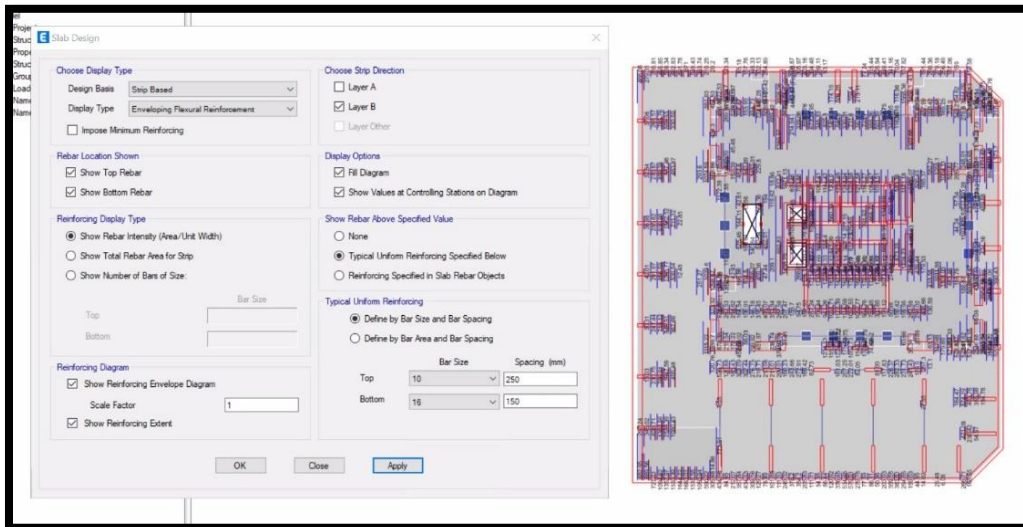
Mid-Span Y-Direction Reinforcement for 4th Basement Floor
